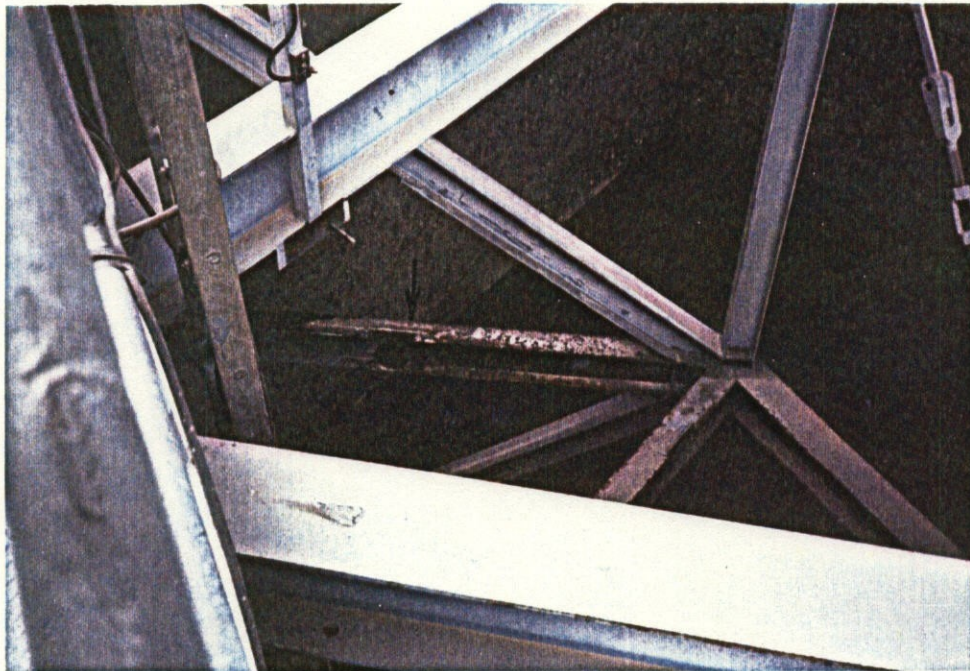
Close-up view of corroded steel member of west gate. (18 March inspection)
